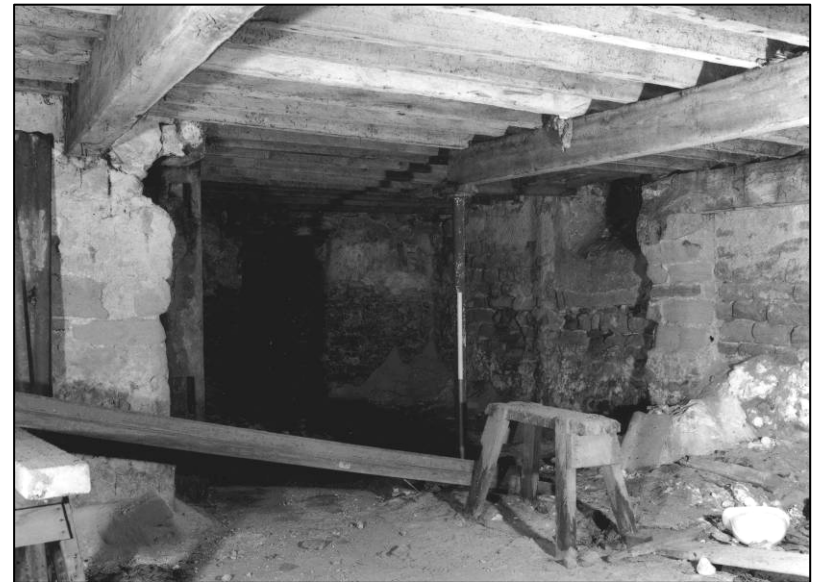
Remains of arch/arches, N end of ground floor spine wall, looking W (photo 4/3).
